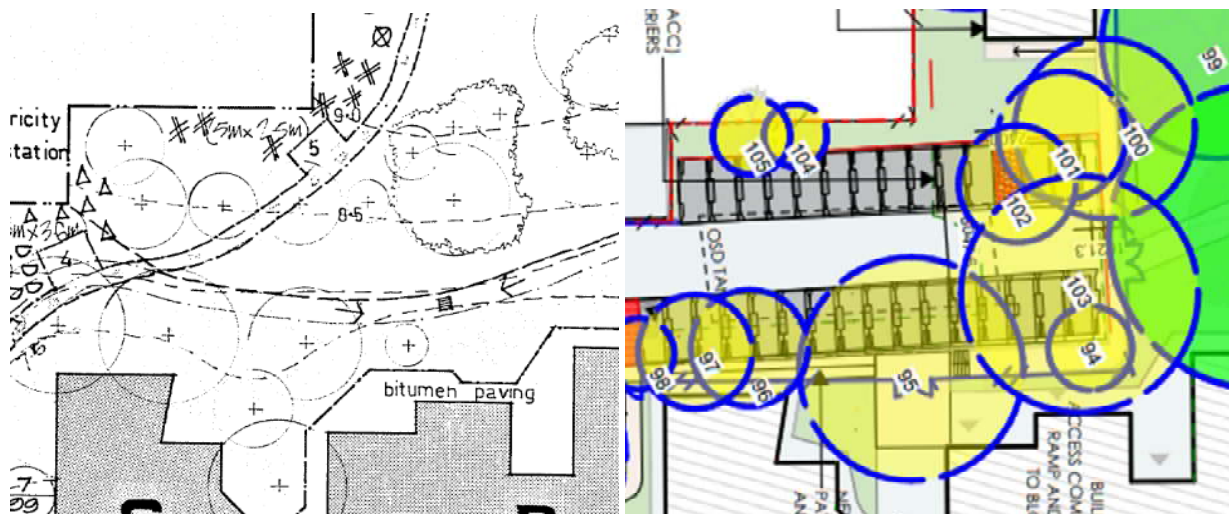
Excerpts, Landscaping and Site Plan, 1977 and Tree Location Plan, 2023.
